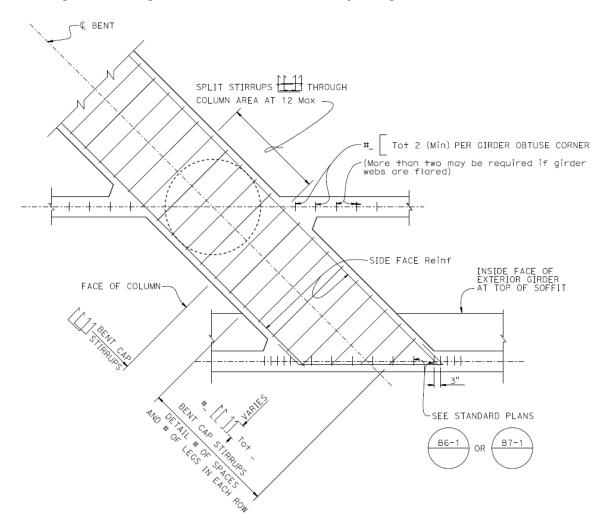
Stirrup Reinforcement at Skewed Bent Caps (Greater than 20° Skew)
